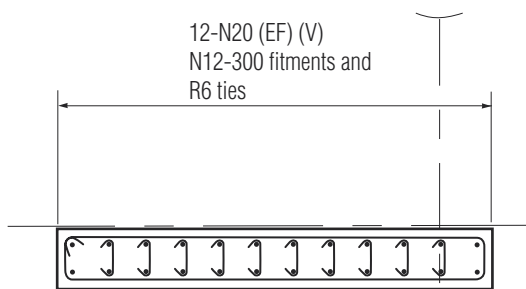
This figure shows a reinforced wall with straight bars to the vertical reinforcement, together with fitments to all the vertical bars, so the wall is acting as a column.
